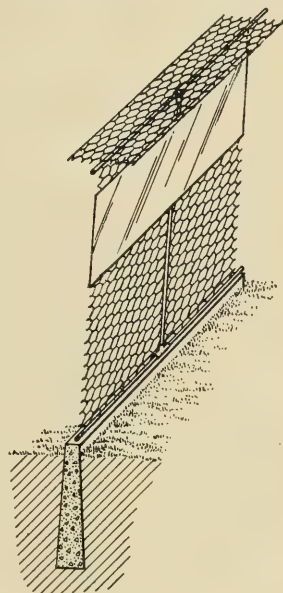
Section of a fence containing a smooth zone to protect foxes from injury by falling. Concrete foundation and iron posts.
